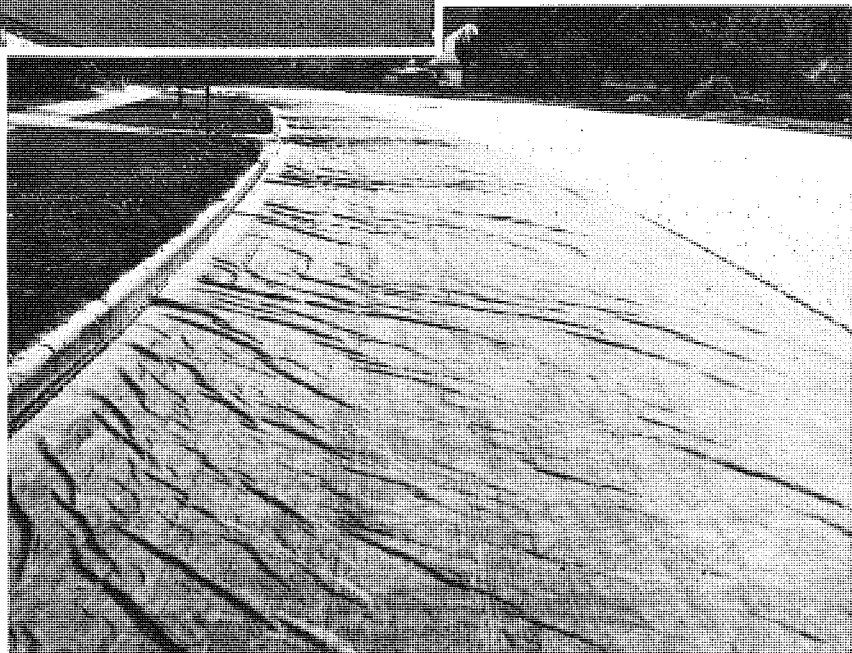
On some straight sections, the bonded fabric showed large wrinkles.
